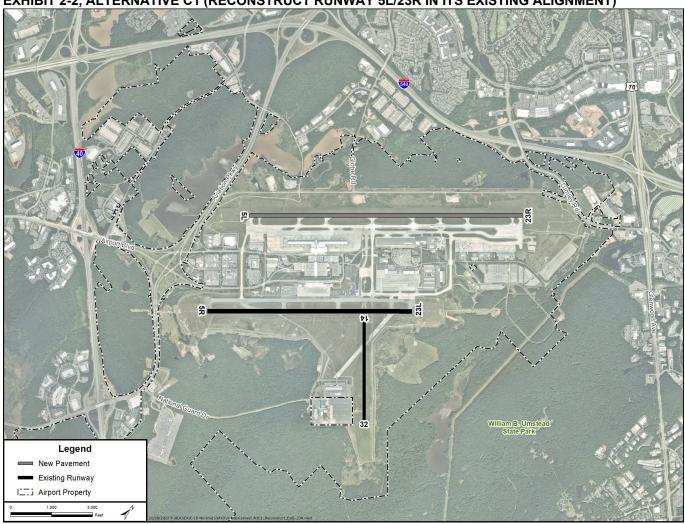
, ALTERNATIVE C1 (RECONSTRUCT RUNWAY 5L/23R IN ITS EXISTING ALIGNMENT)
